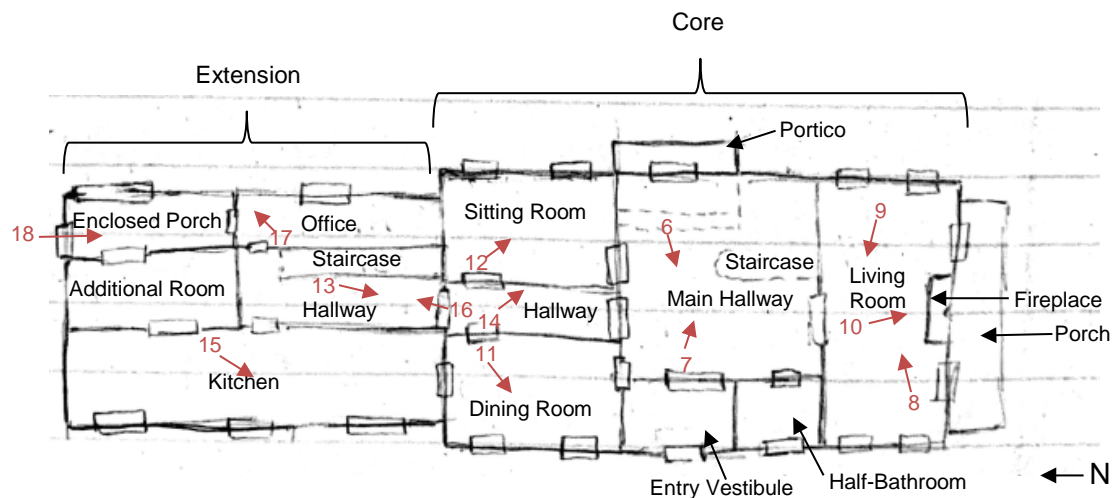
Floor Plan Sketch and Interior Photograph Key of the First Floor. Sketch not to scale.
